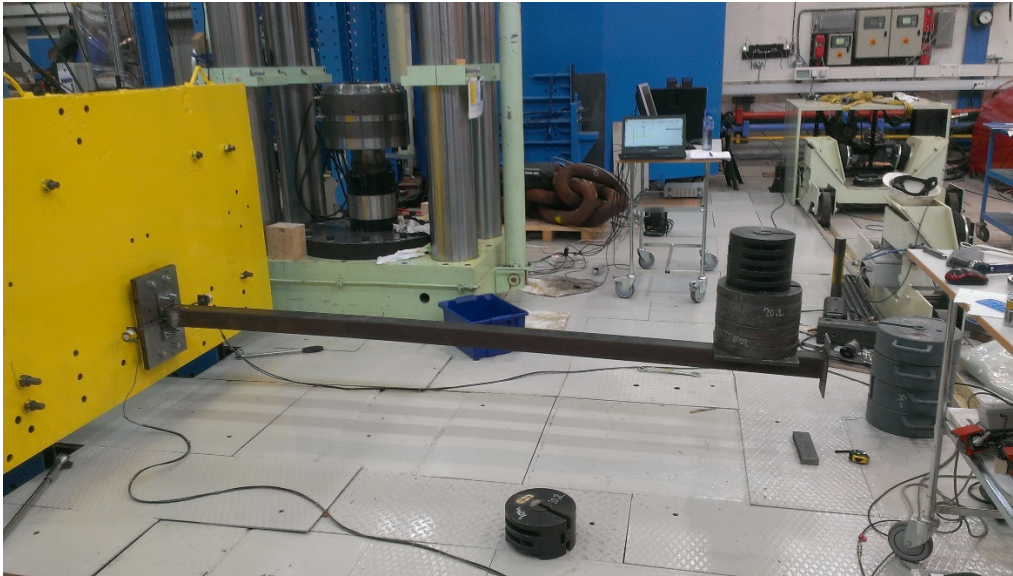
The actual connection, bolted to the rigid wall as a cantilever beam.
